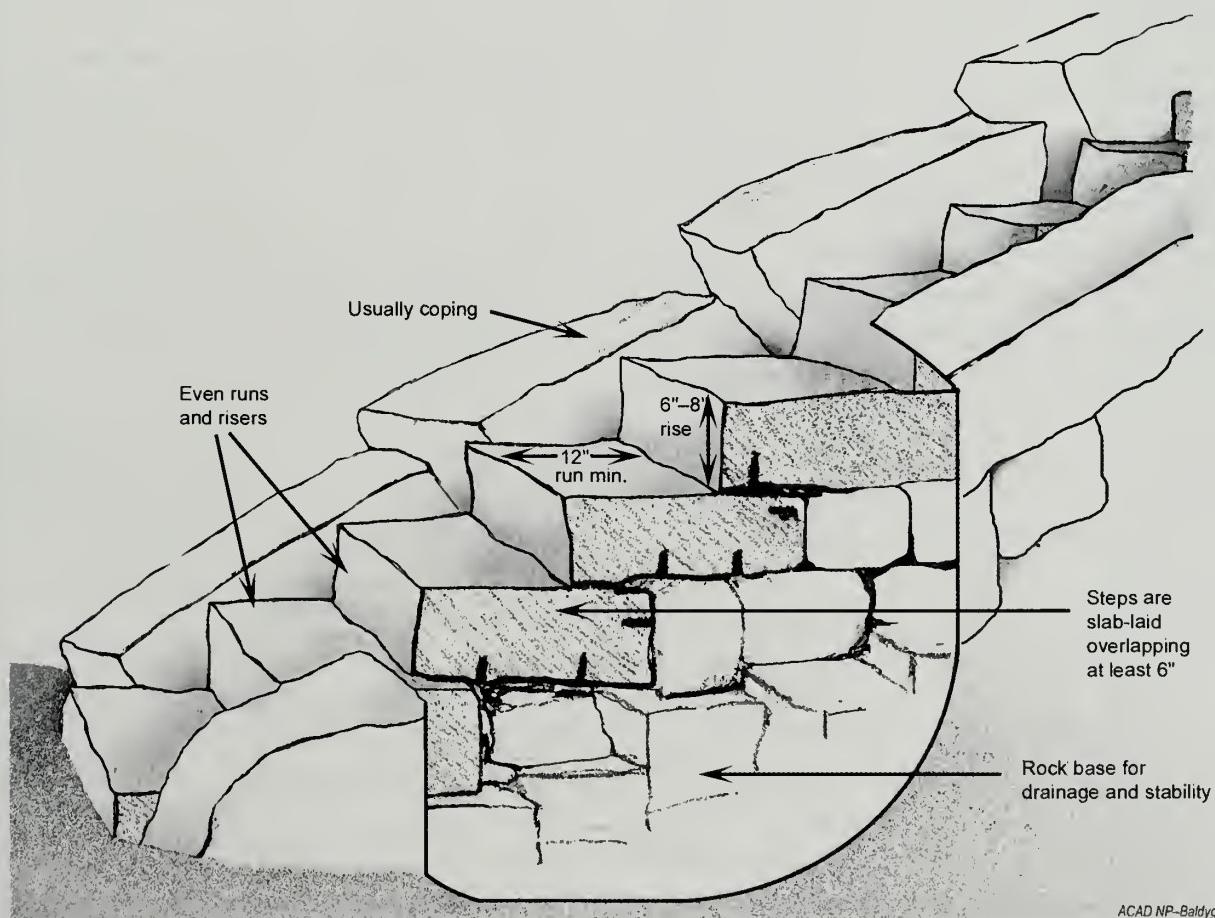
Detail of a typical staircase from the CCC or VIA/VIS period.
